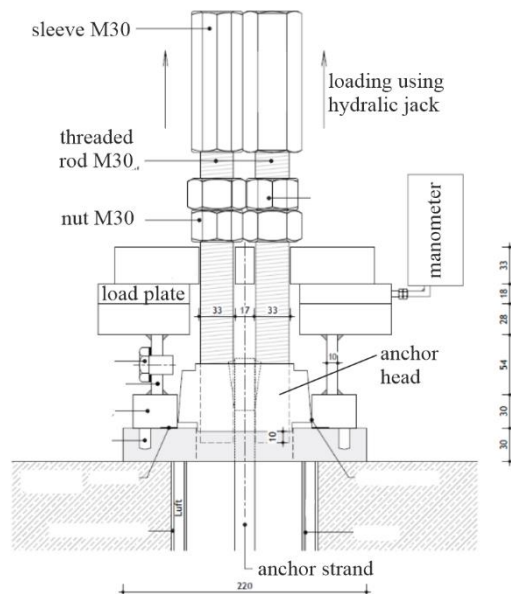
Example of retrofitting an anchor load plate on a partially occupied anchor head.
